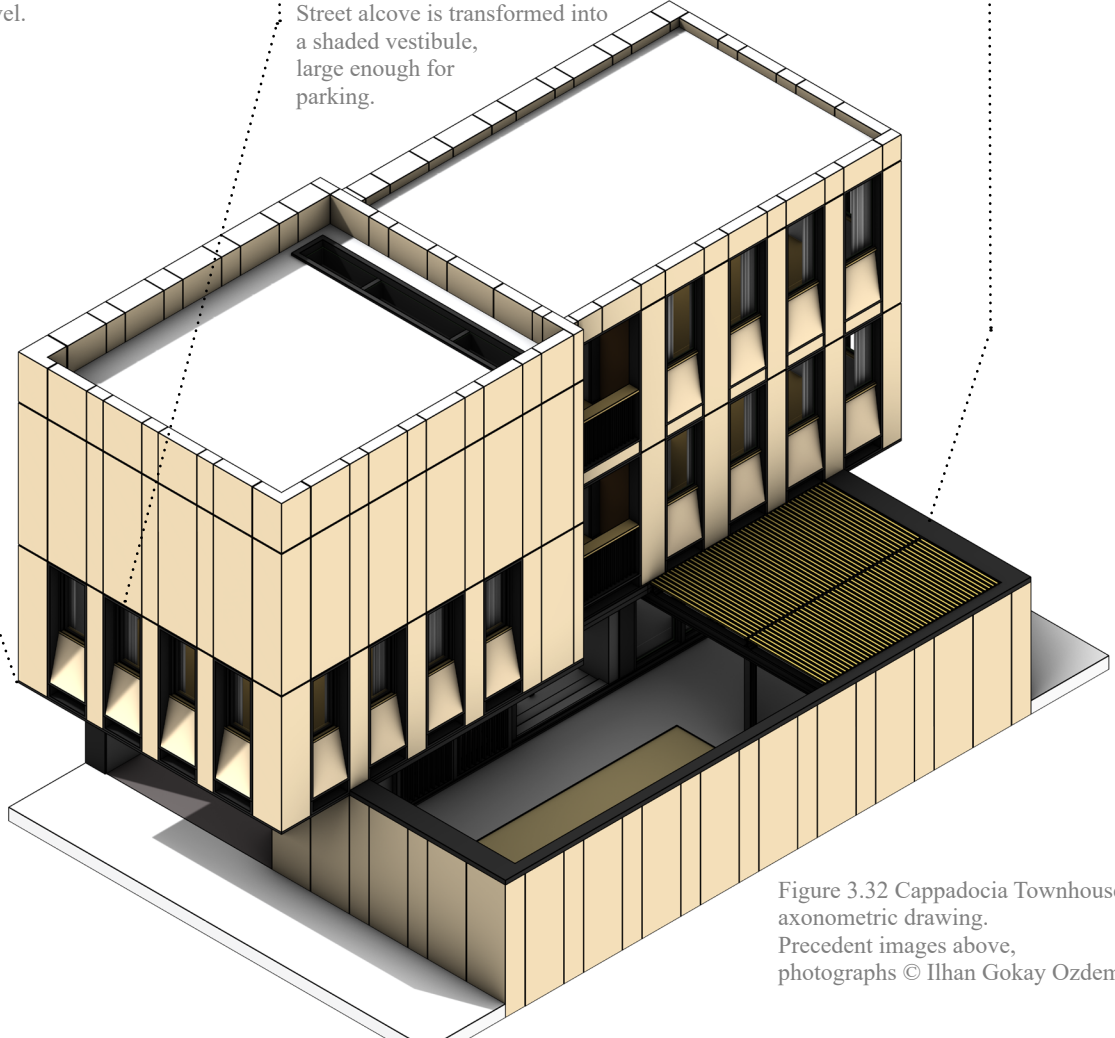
Cappadocia Townhouse, axonometric drawing. Precedent images above, photographs © Ilhan Gokay Ozdemir.
